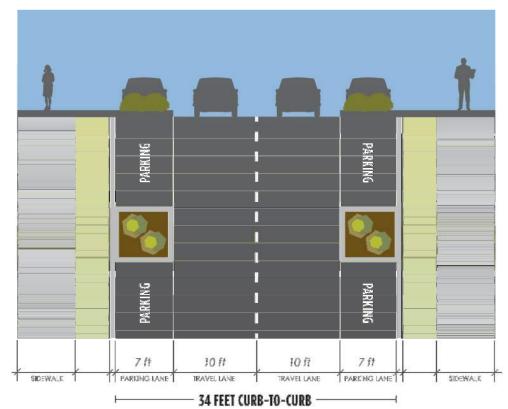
Inset Parking Layout and Dimensions Source: Nelson\Nygaard.
